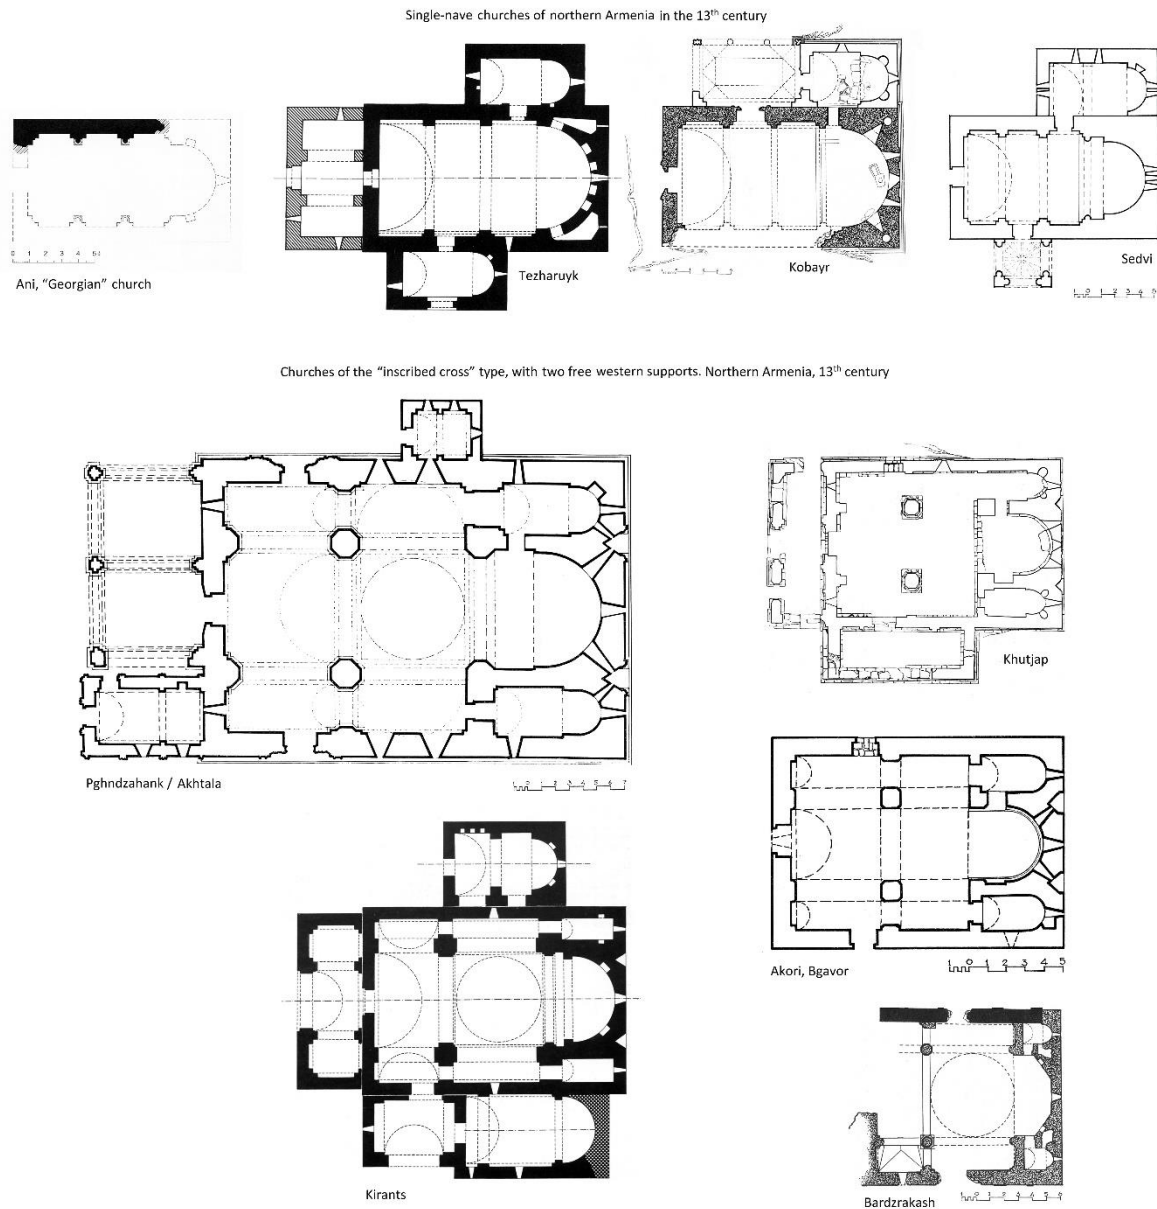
Plans of 13th c. churches of northeastern Armenia,
